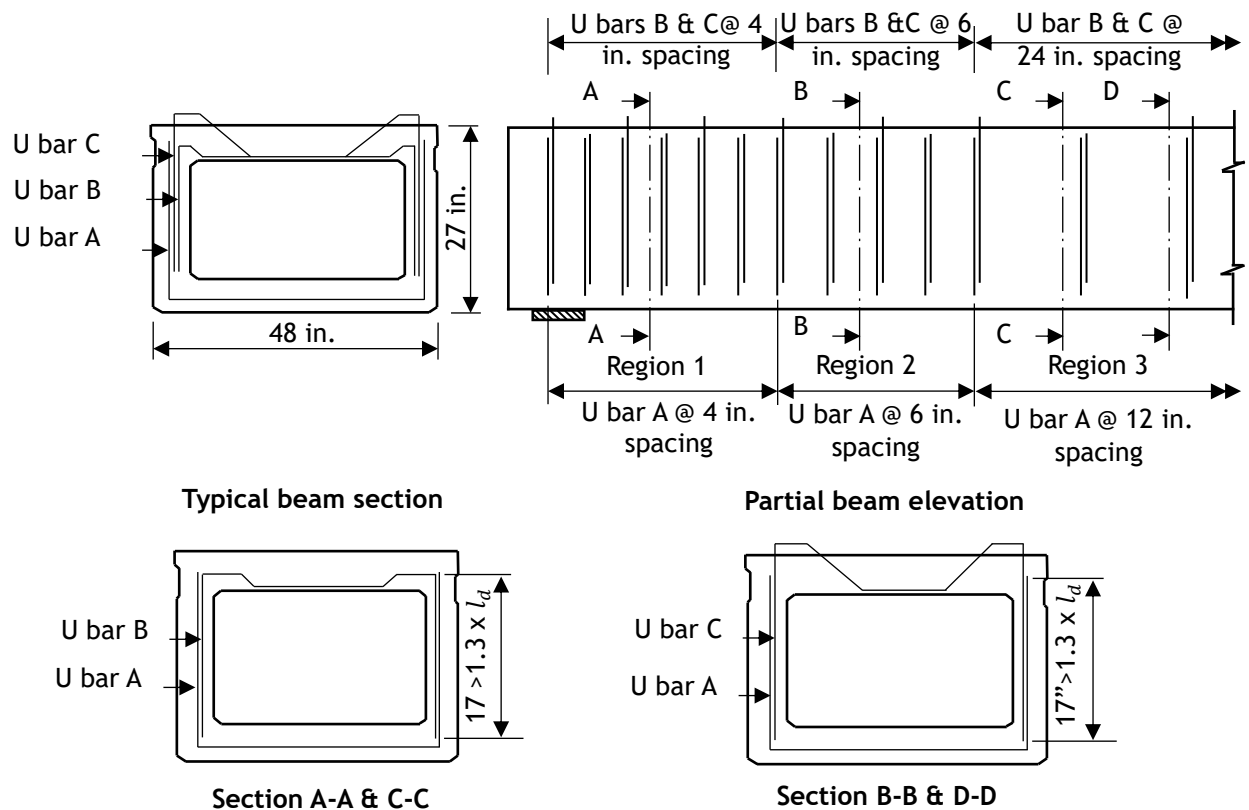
Typical beam section and elevation of CB27-48 beam.
